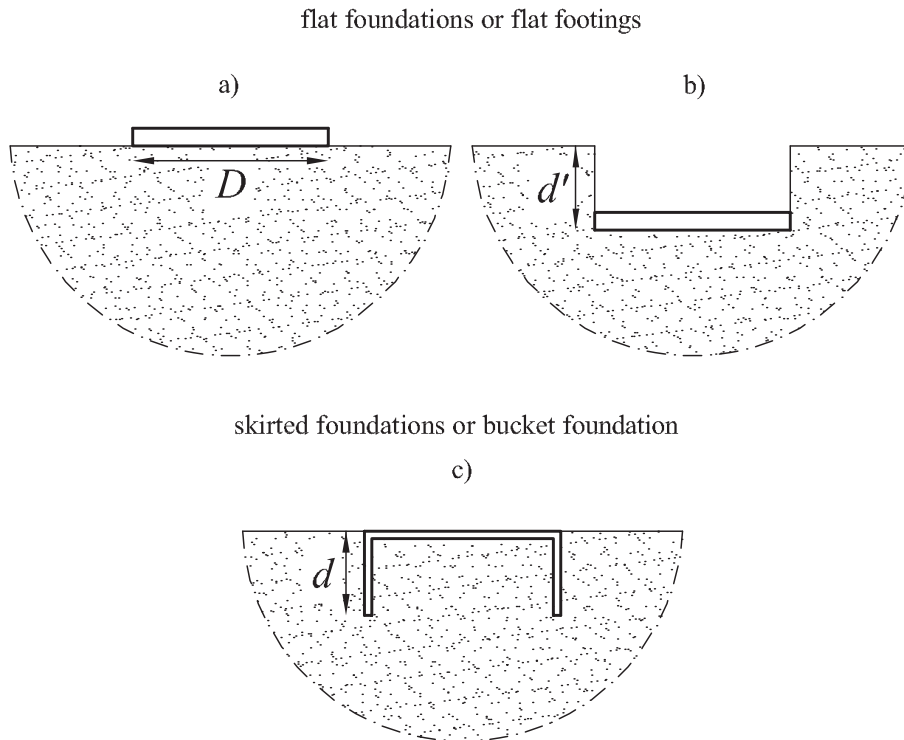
a) standard flat footing; b) buried or embedded footing; c) skirted foundation or bucket foundation
